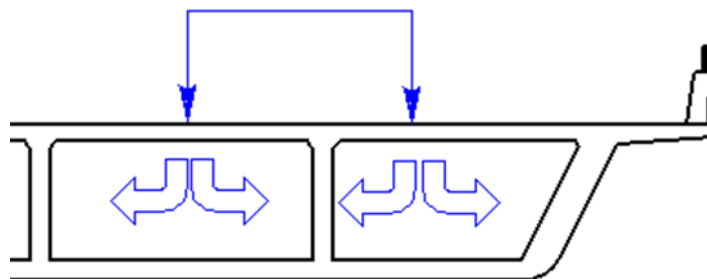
Truck Load Path from Deck Slab to Girders
